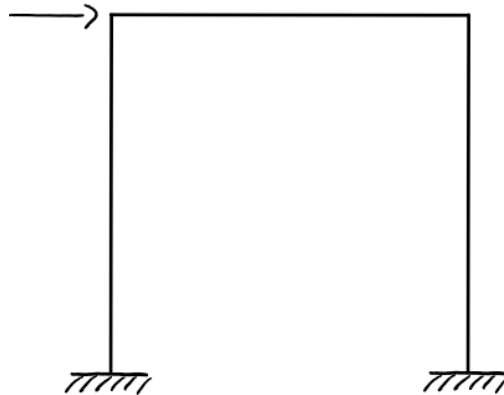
Fixed base portal frame subject to a horizontal load in the top left corner.
